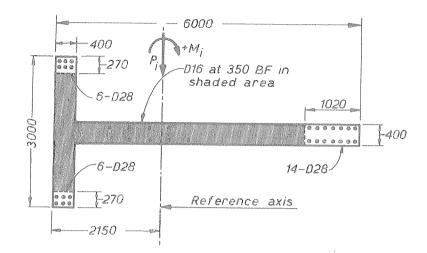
Sectional Properties of an Example Shear Wall Section.
